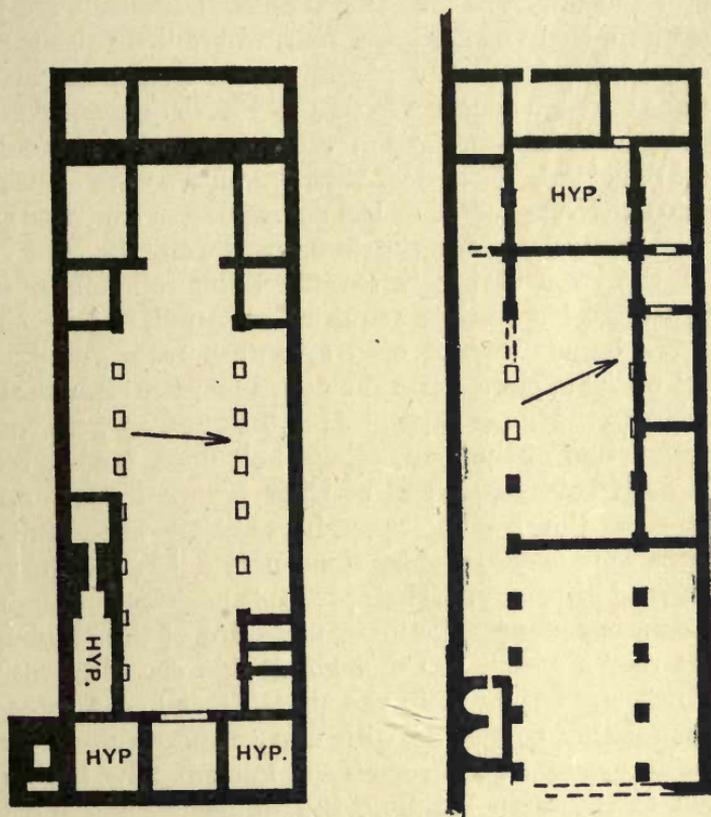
Basilical Houses at Mansfield Woodhouse, and Brading. (40 ft. to 1 in.)
